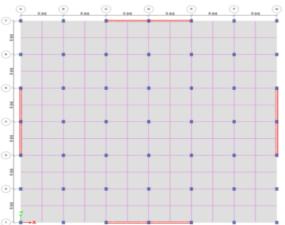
Flat slab with shear wall having(G+12) story building (Plan View)
